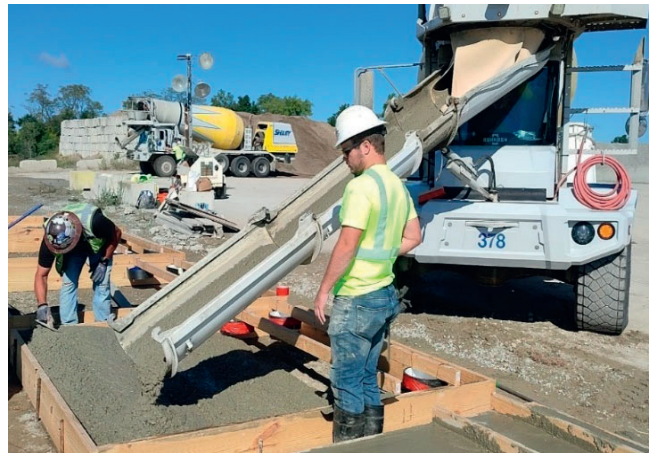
Field Casting of 8 ft × 8 ft × 10 in. Concrete Slabs.
